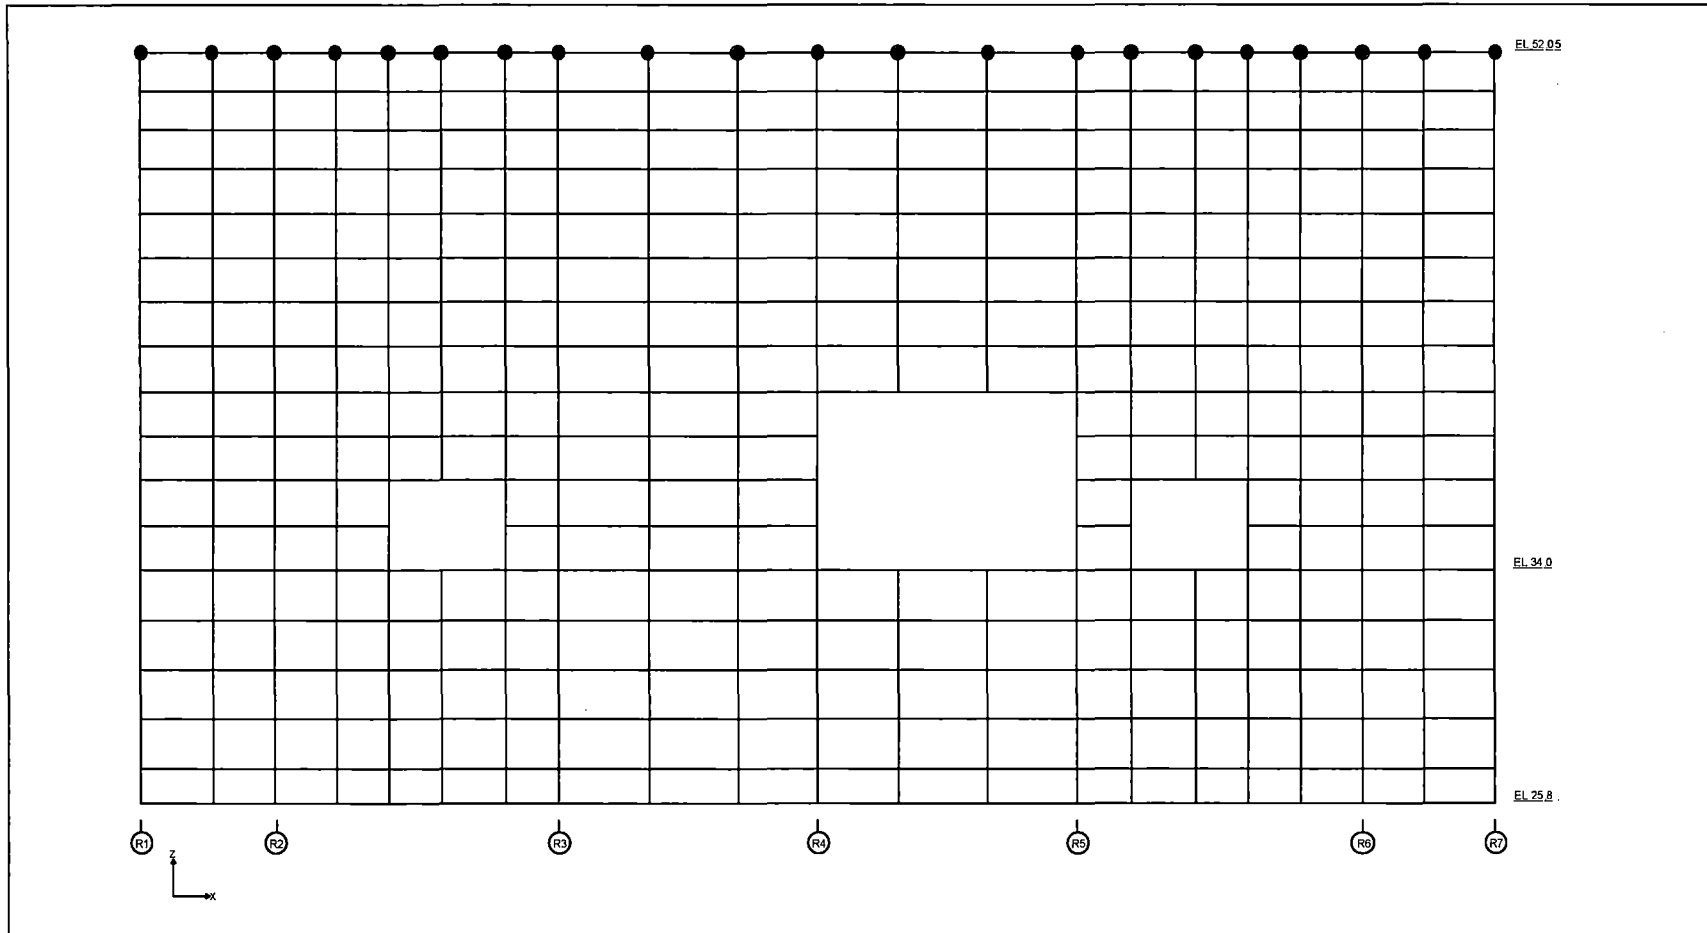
Application of Overturning Moments to the External Wall on RF Column Line
